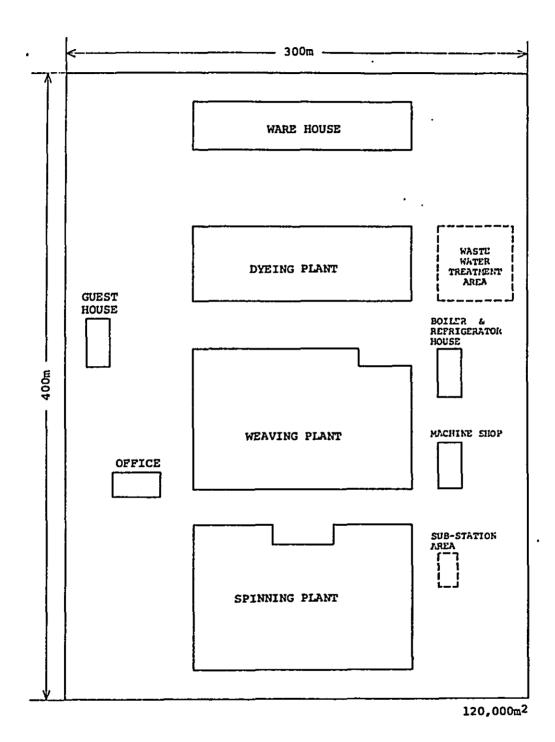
Plant Layout for Integrated Plant (Polyester/Cotton Blended Fabric)
